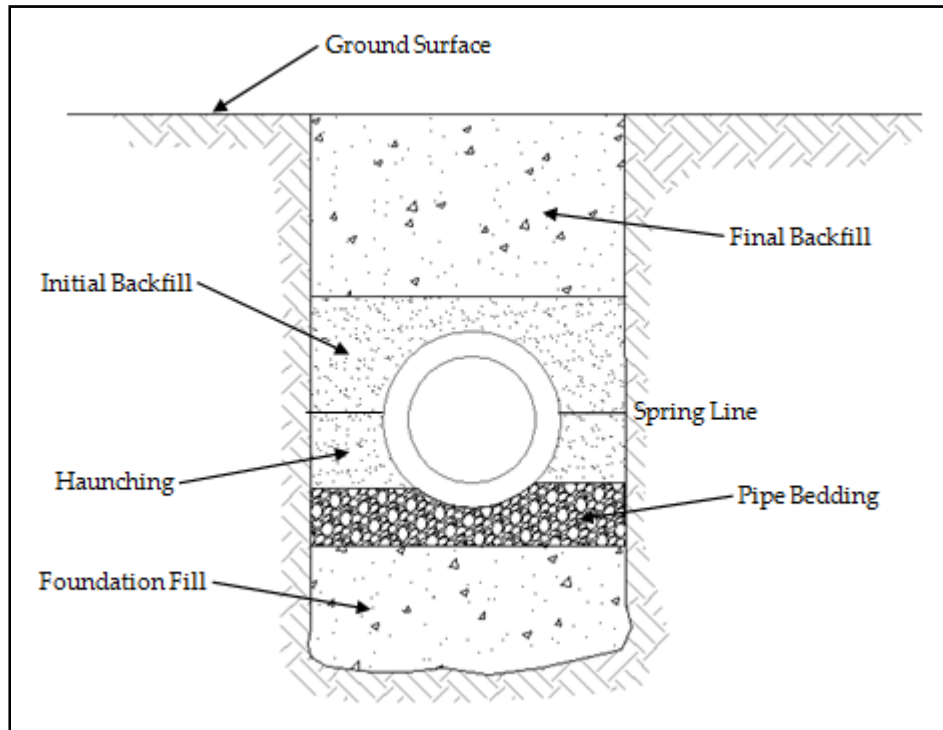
Typical detail of pipeline embedment zones (not to scale).
